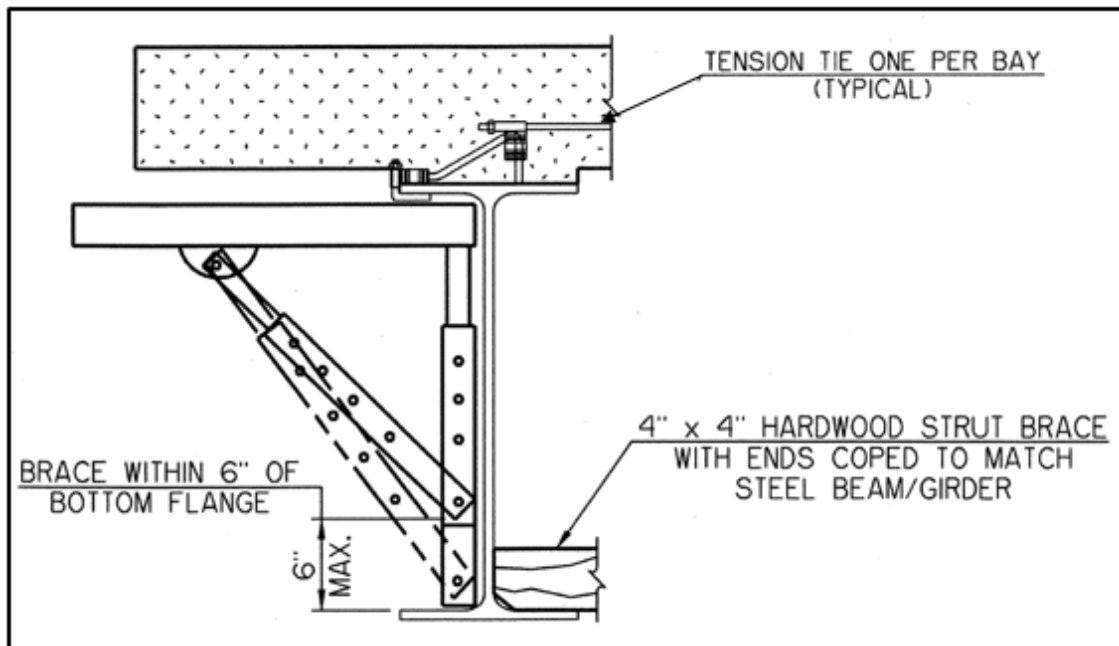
ODOT standard detail drawing for Bridge Deck Overhang Formwork Bracing (Dayton Superior Bridge Deck Handbook 2017)
